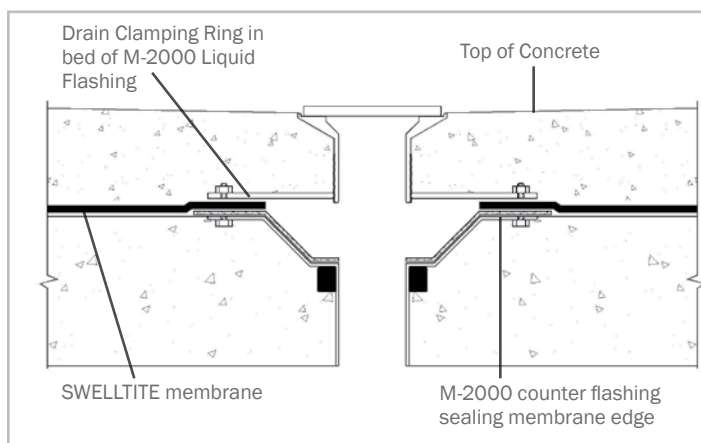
Deck drain detail. CETCO recommends using a double stage drain for all deck drains.
